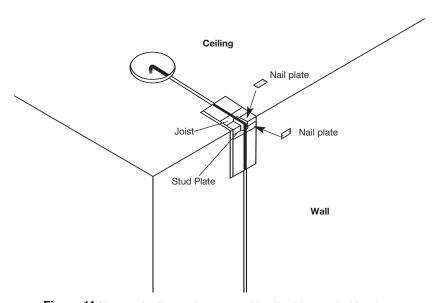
Diagram of ceiling speaker cut-out with ceiling joists notched for wire run.
